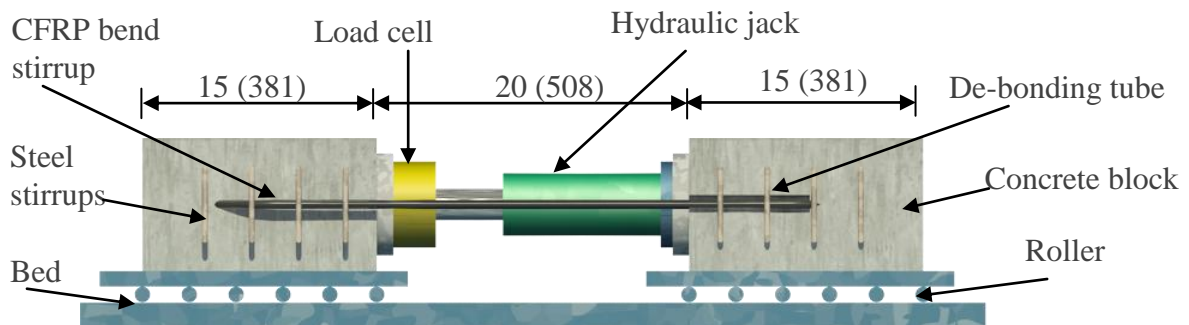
Details of test specimen according to ACI 440.3R-12 B.5 test method
